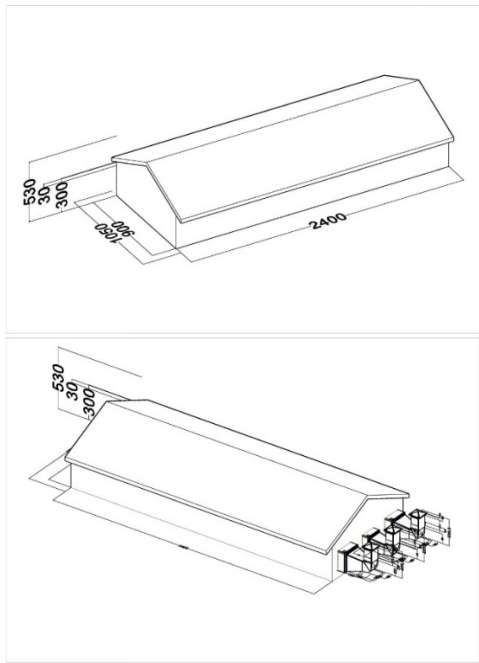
Design of the application of modified exhaust fans in broilers close house.
